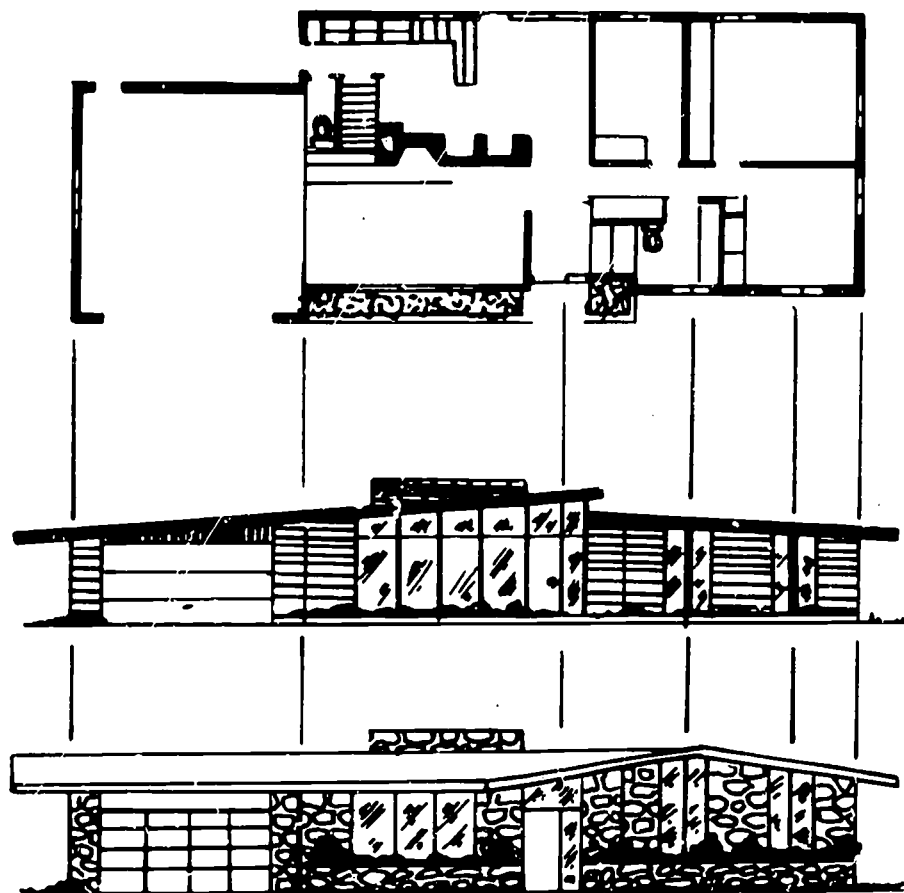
E-1. Two Different Elevation Styles Projected from One Floor Plan
